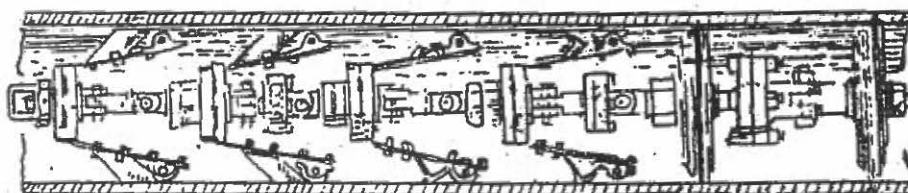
Hill-Hodgman Pipe Cleaning Machine. ✓
